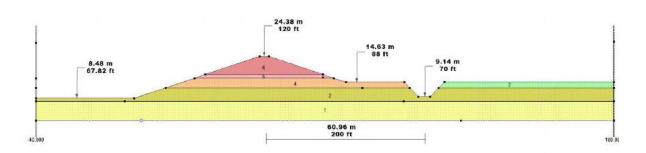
Cross-section Addicks Dam section A4, for legend see Appendix F
